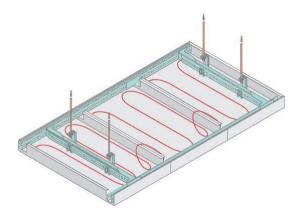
Radiant heating/cooling system embedded in the ceiling panel (6)
